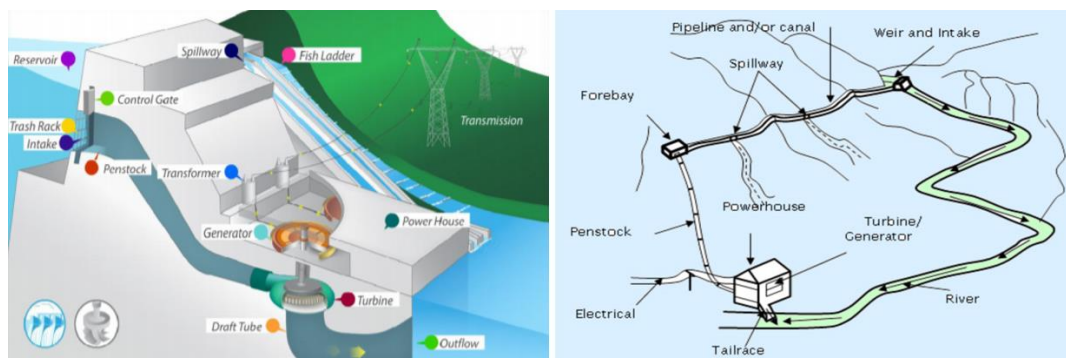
Typical Reservoir (Left) and Run-Off River (Right) Hydropower Project Layouts³
